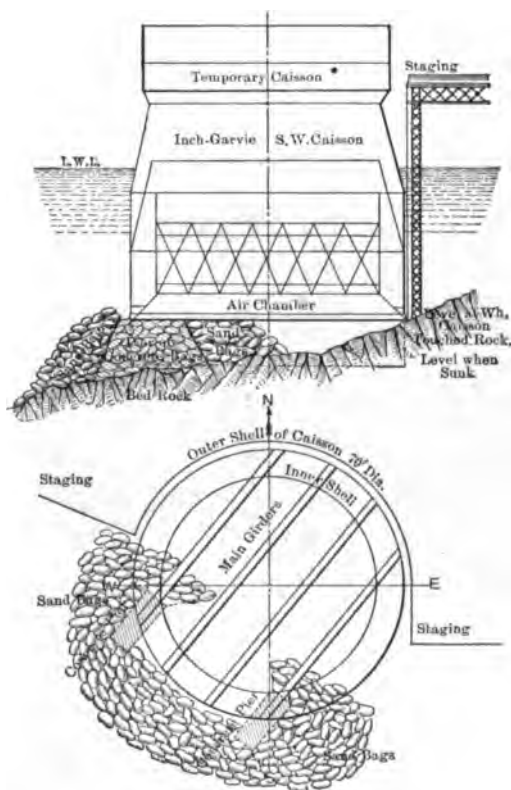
INCHGARVIE PIERS ON SLOPING ROCK.
